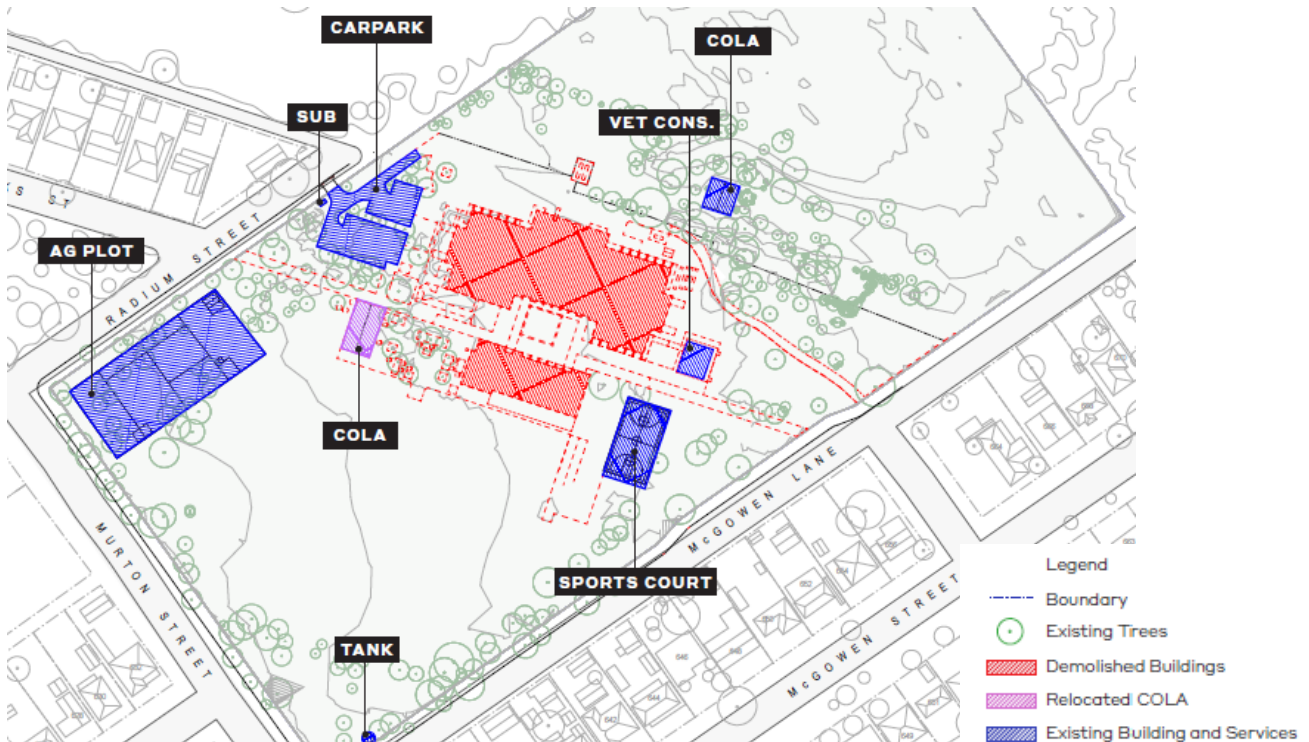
Extract of existing site assets (Source: Woods Bagot)
